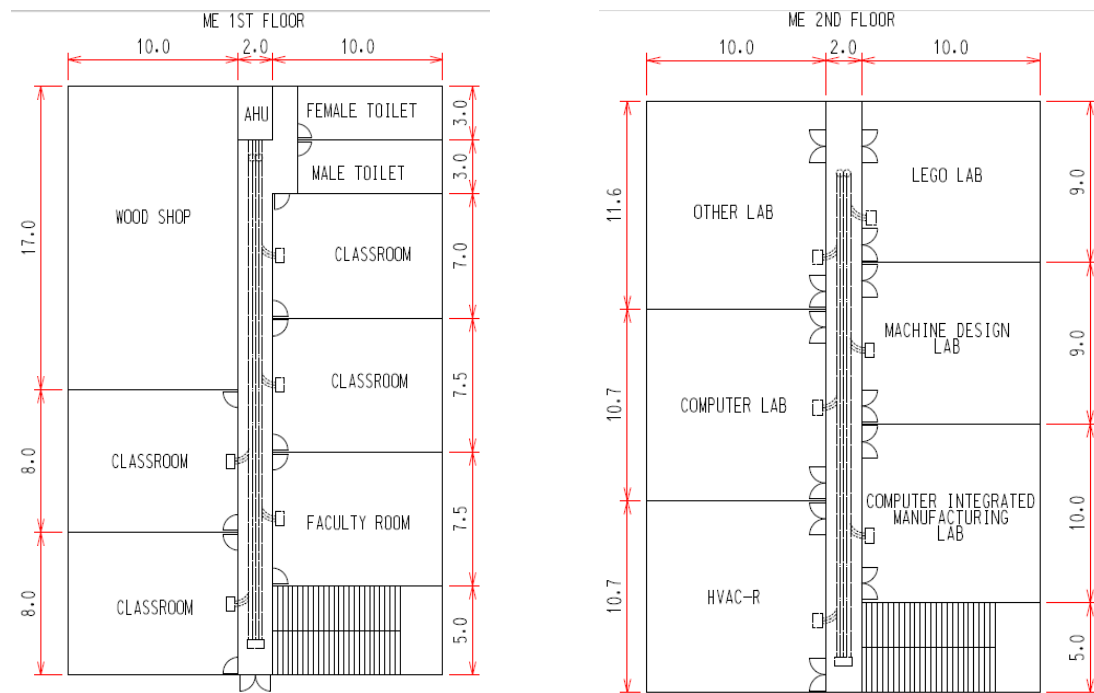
The air conditioning ducting and floor plans for the mechanical engineering building.
